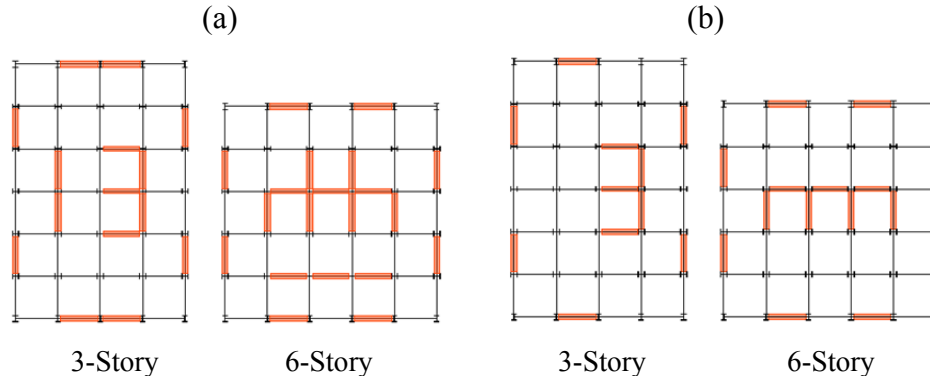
Los Angeles Prototype Plans with Hybrid Masonry Panel Locations (a) R=5 (b) R=7
